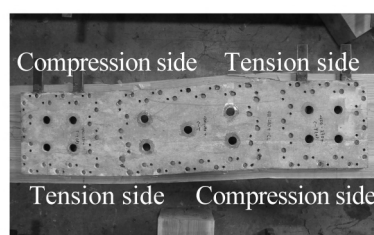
Bendig deformation of steel of T-member at joint end
